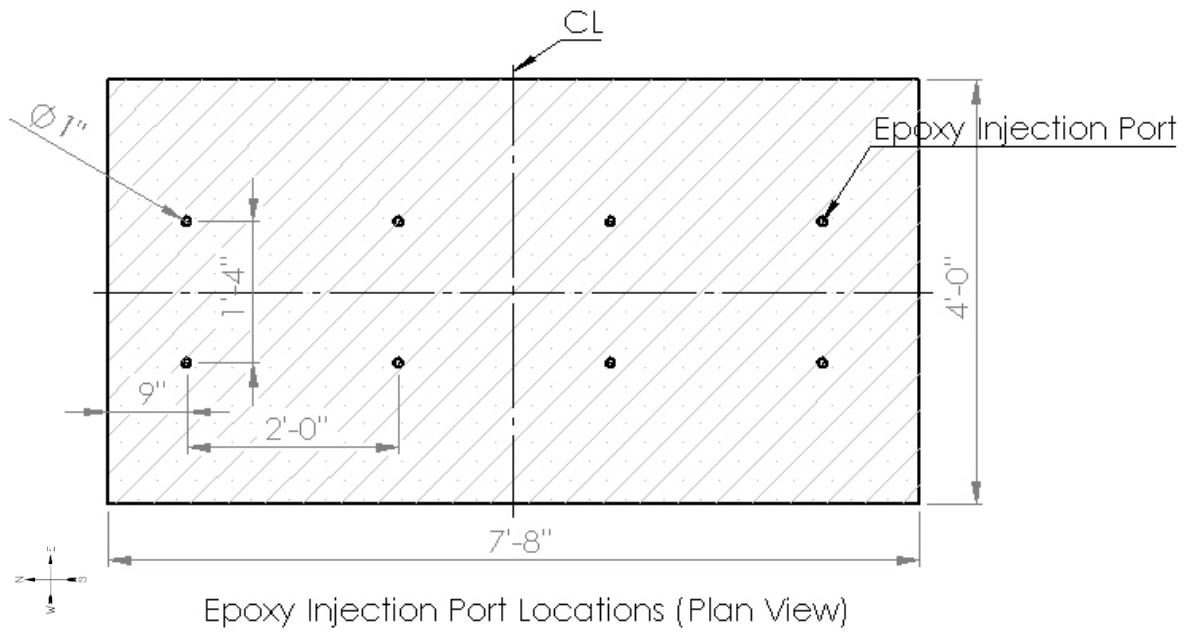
Schematic diagram of epoxy port sites (plan view).
